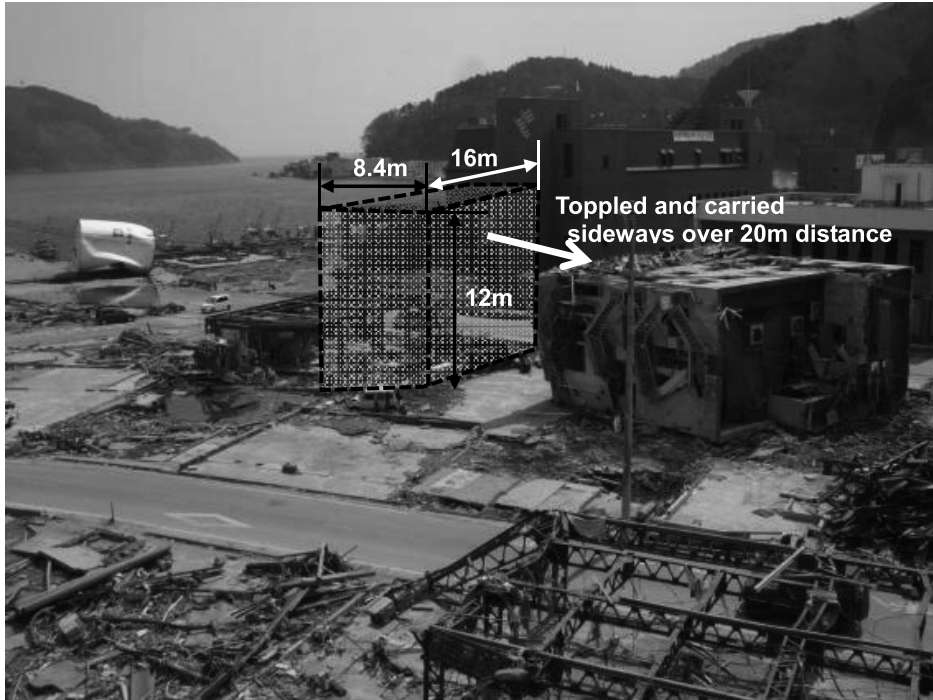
Building #3 (Original location at Original Location: 38.442657,141.446590), A steel frame 4-story building was toppled and carried sideways over about 20m distance. A PHC pile of about 6m long is found hanging down from the upper right corner.
